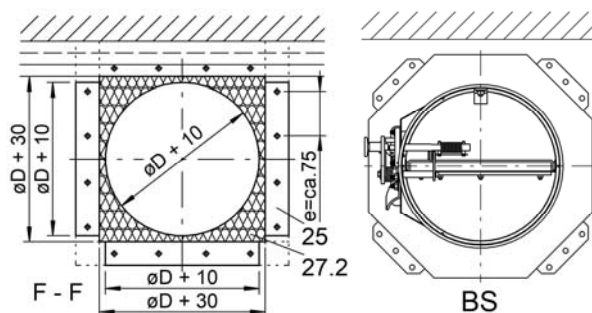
Dry installation on lightweight partition wall with mounting frame AR under solid ceiling
